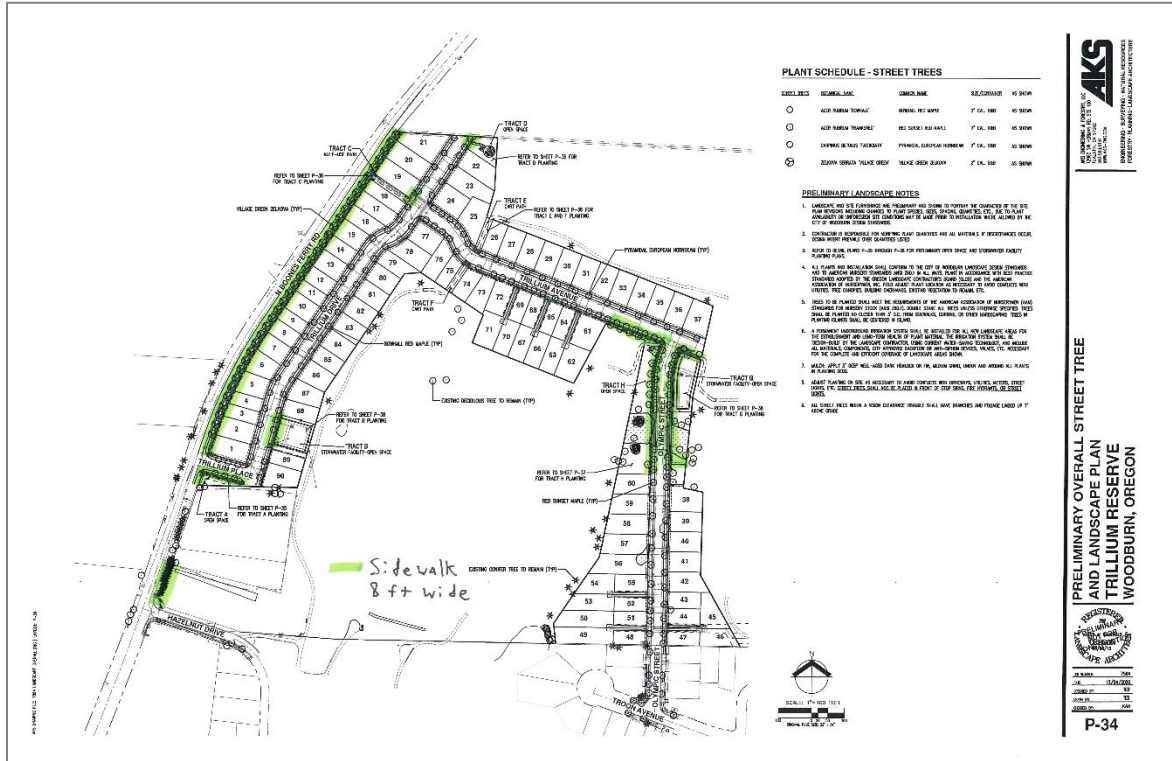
Sidewalks (green: min 8 ft wide)
